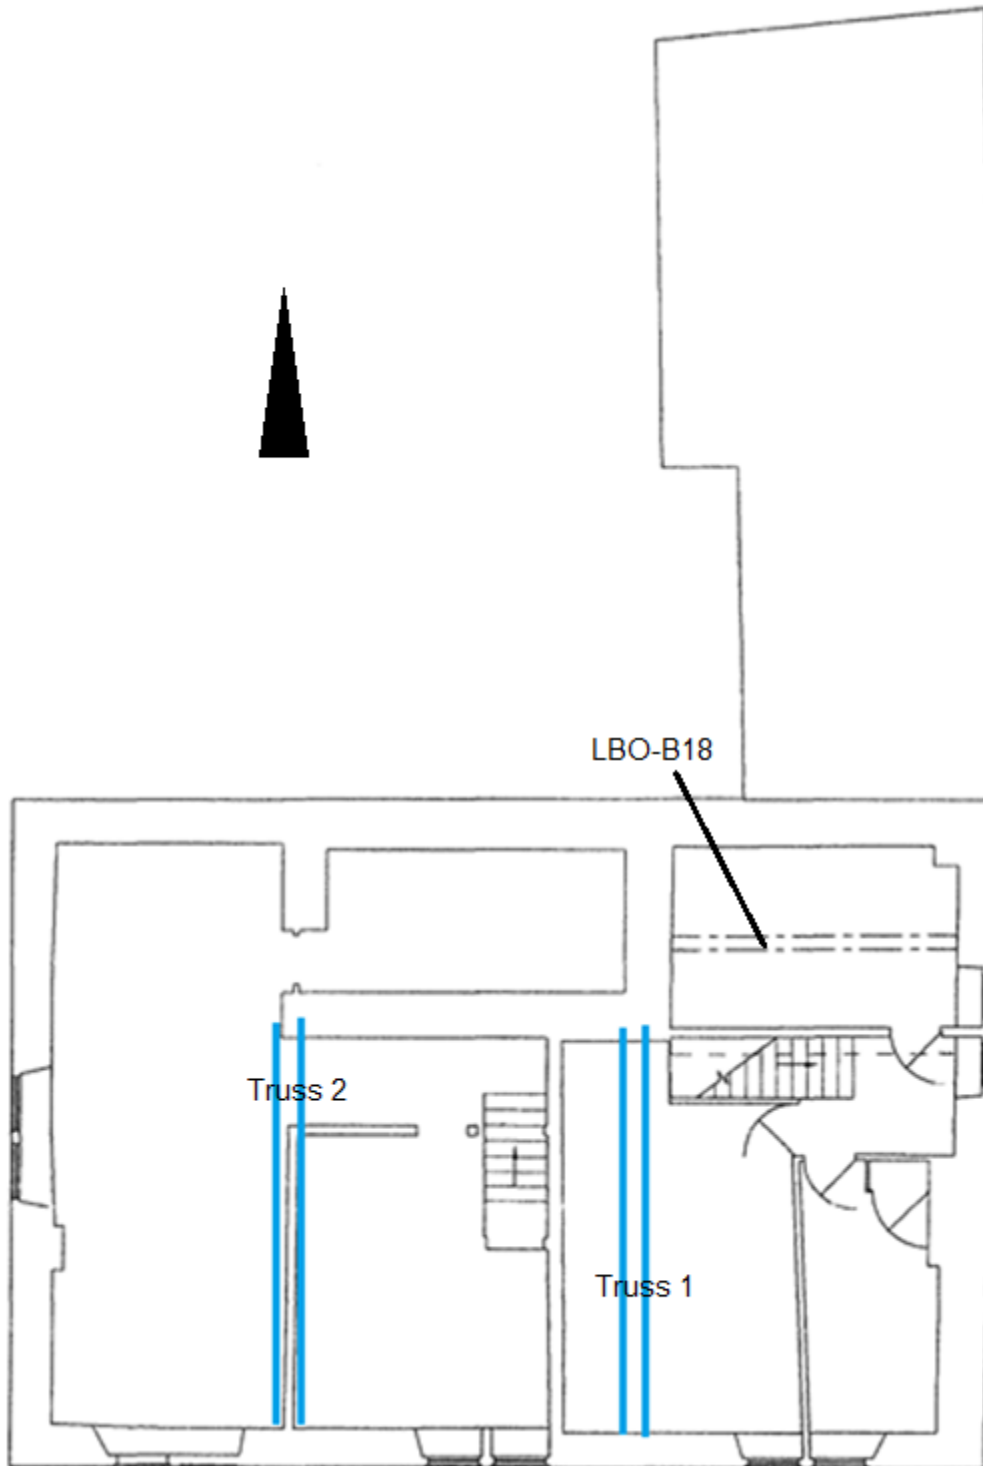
Former farmhouse, first-floor plan, showing truss positions and sample LBO-B18 (Peter Harrison Architects)
